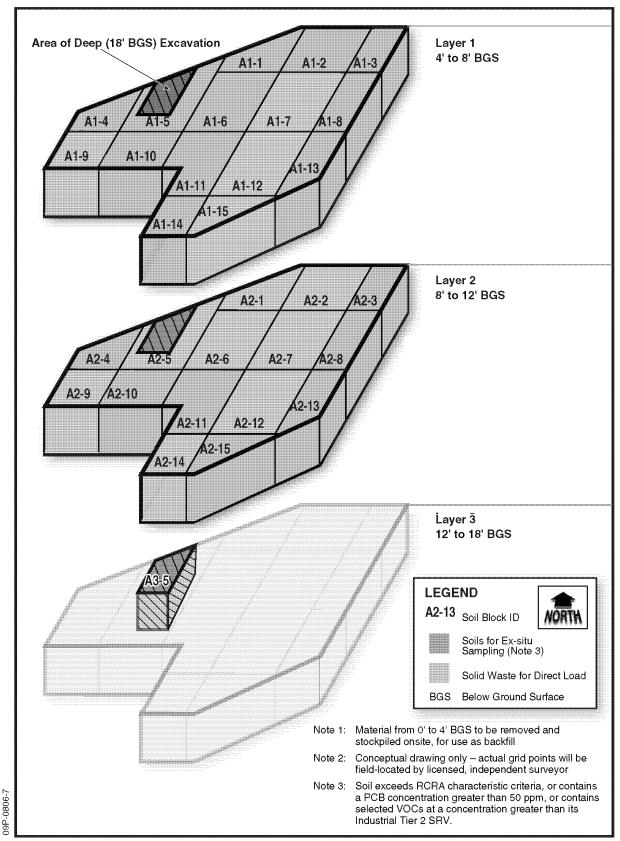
REVISED SOIL DISPOSAL PROFILE AREA A, WOODBURY SITE WOODBURY, MN
